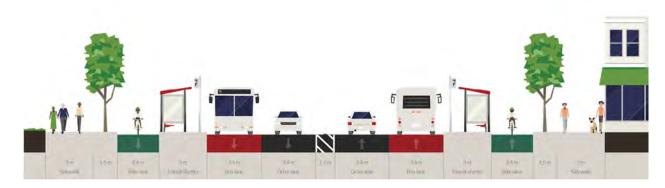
Proposed W 16th Ave Section View between Wesbrook Mall and East Mall
